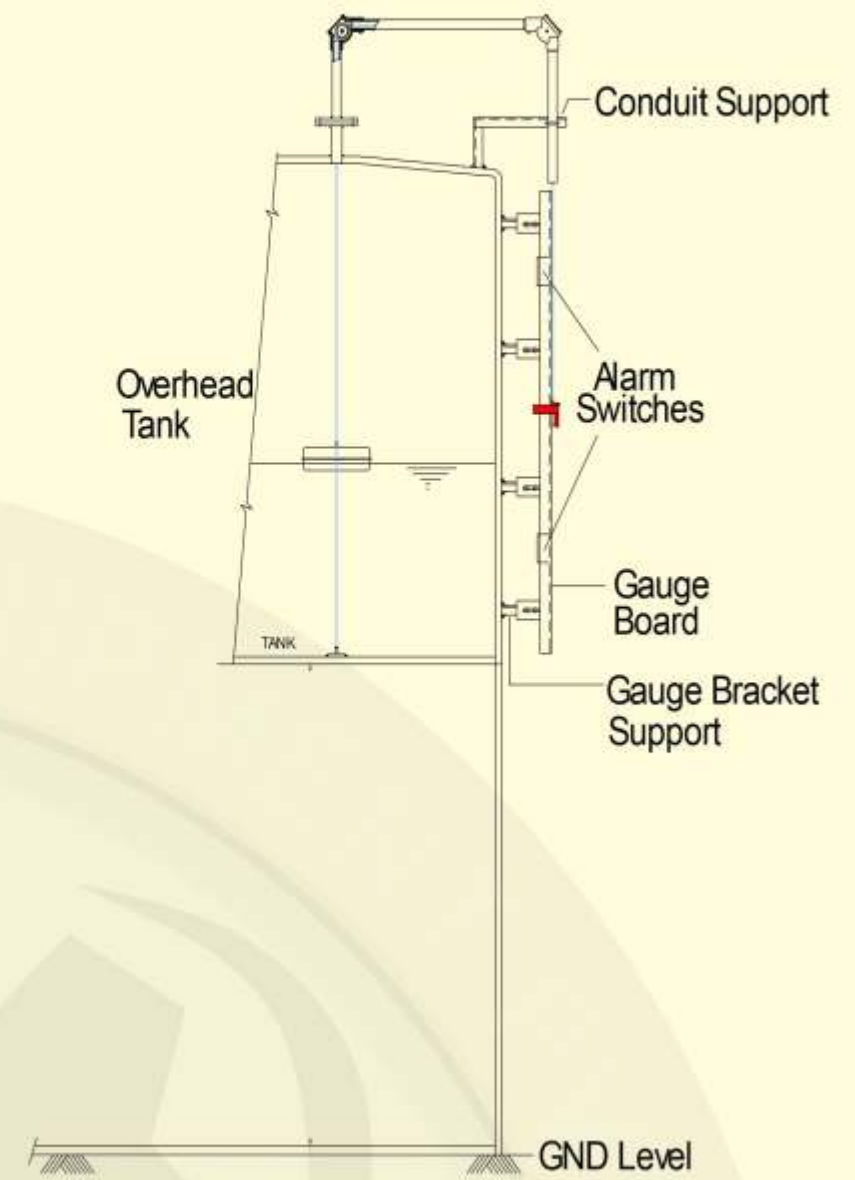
Gauge board with Full Travel Mounted below Elevated Tank
